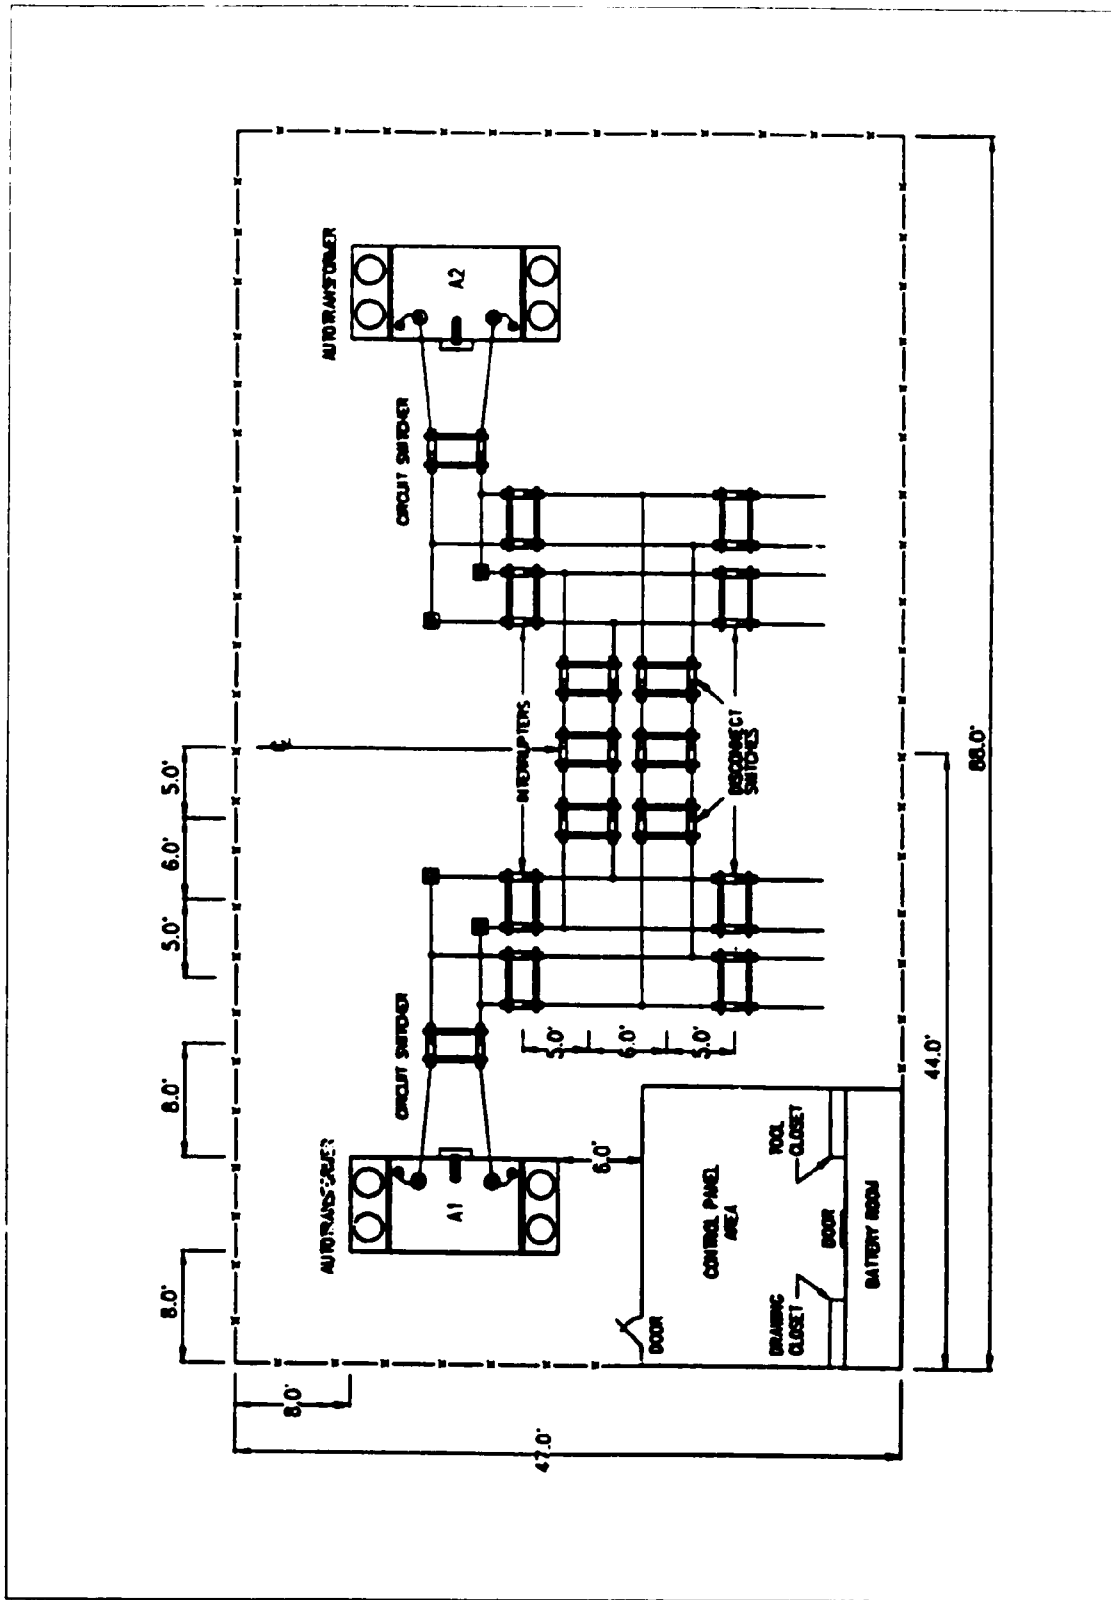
TYPICAL SWITCHING STATION PLAN
